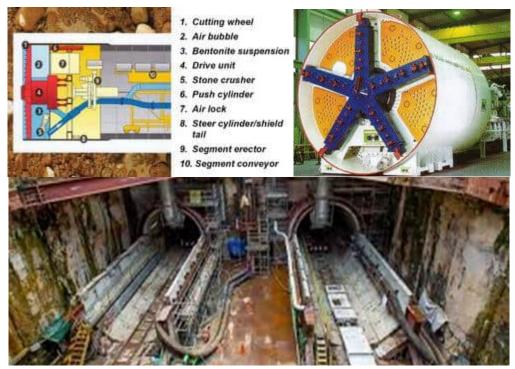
An Example of Slurry TBM [W-56] and Twin-Bored Tunnel at A Station Site in Singapore [W-21]
